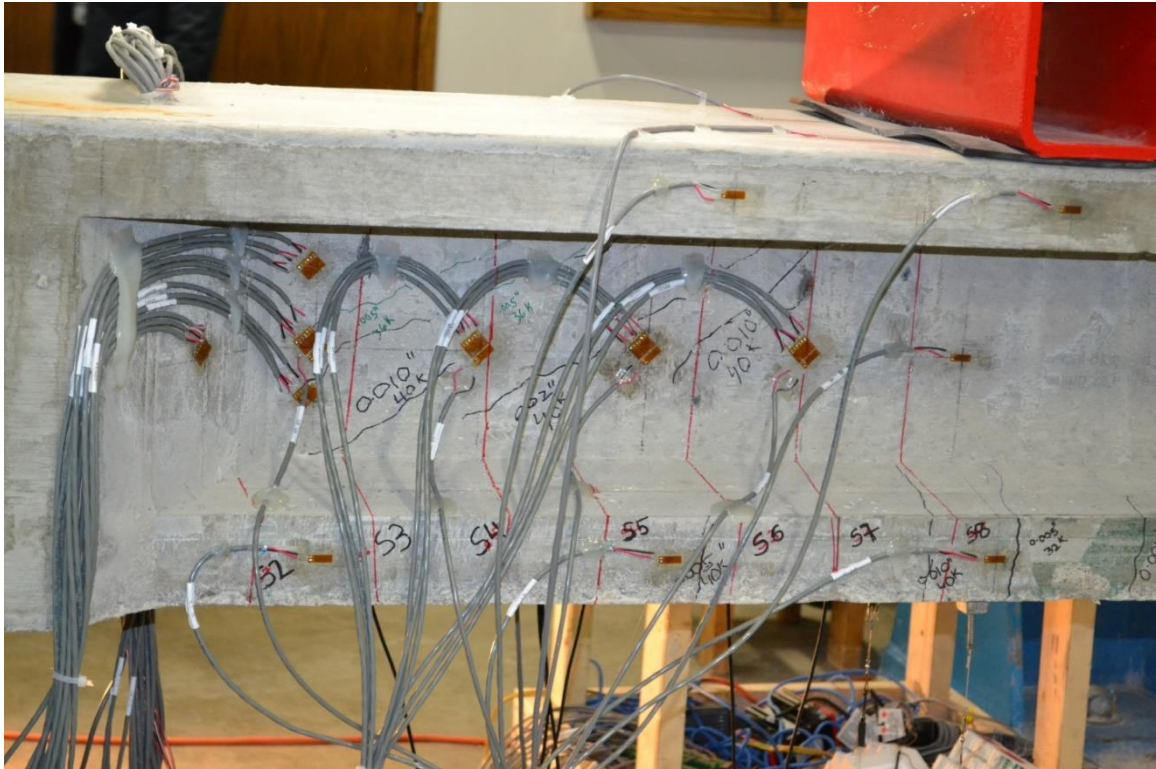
Crack development in shear span of Beam C-C-S-B
